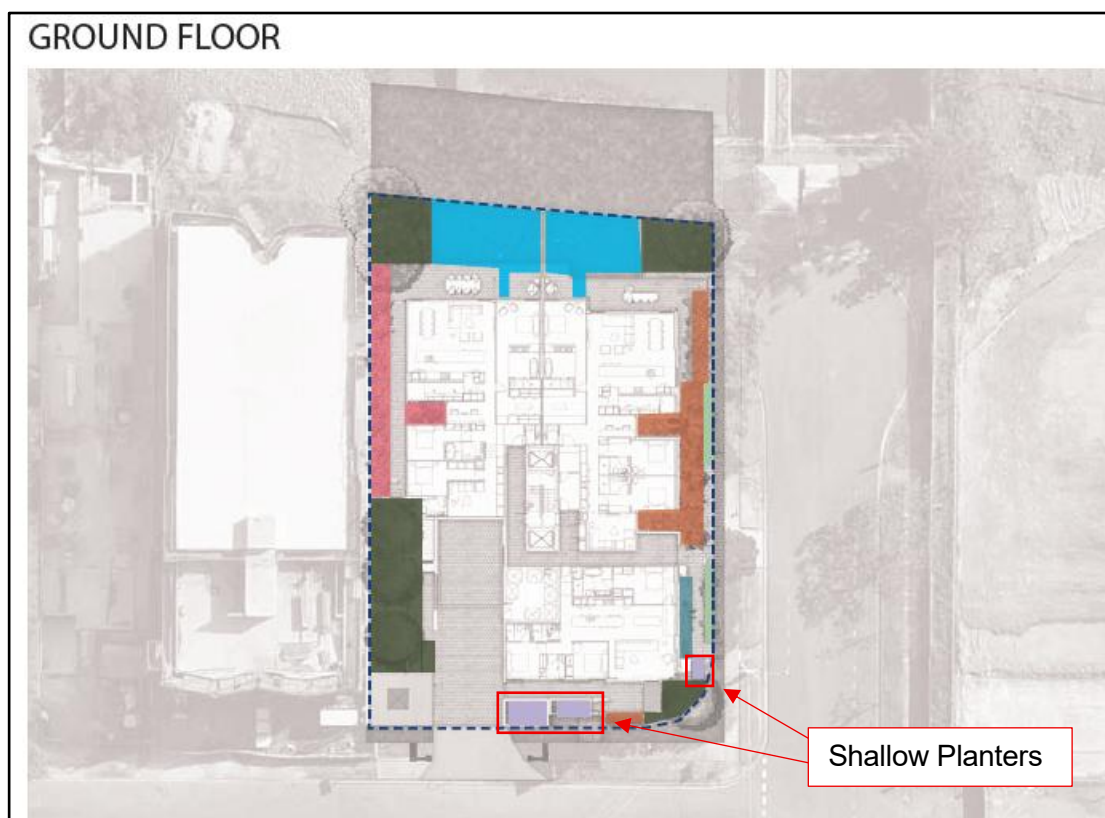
Amended Ground Level Planter Plan (Source: CUSP)
